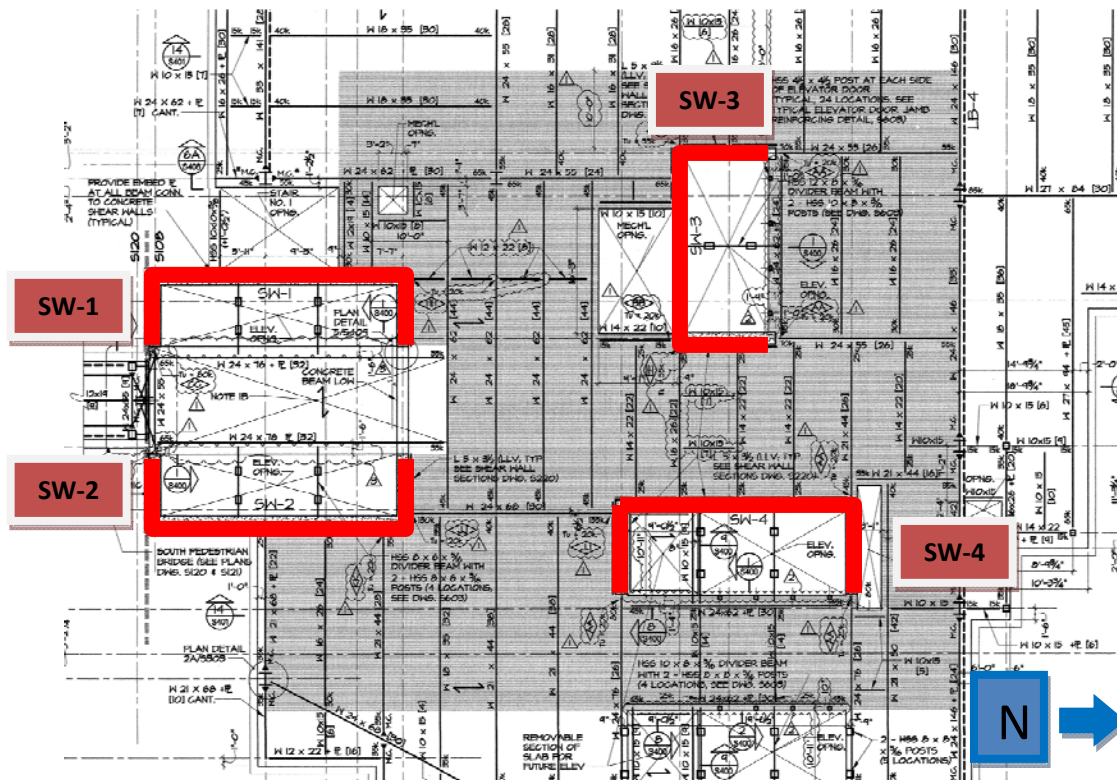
Detailed Plan of Shear Walls and Floor Openings
